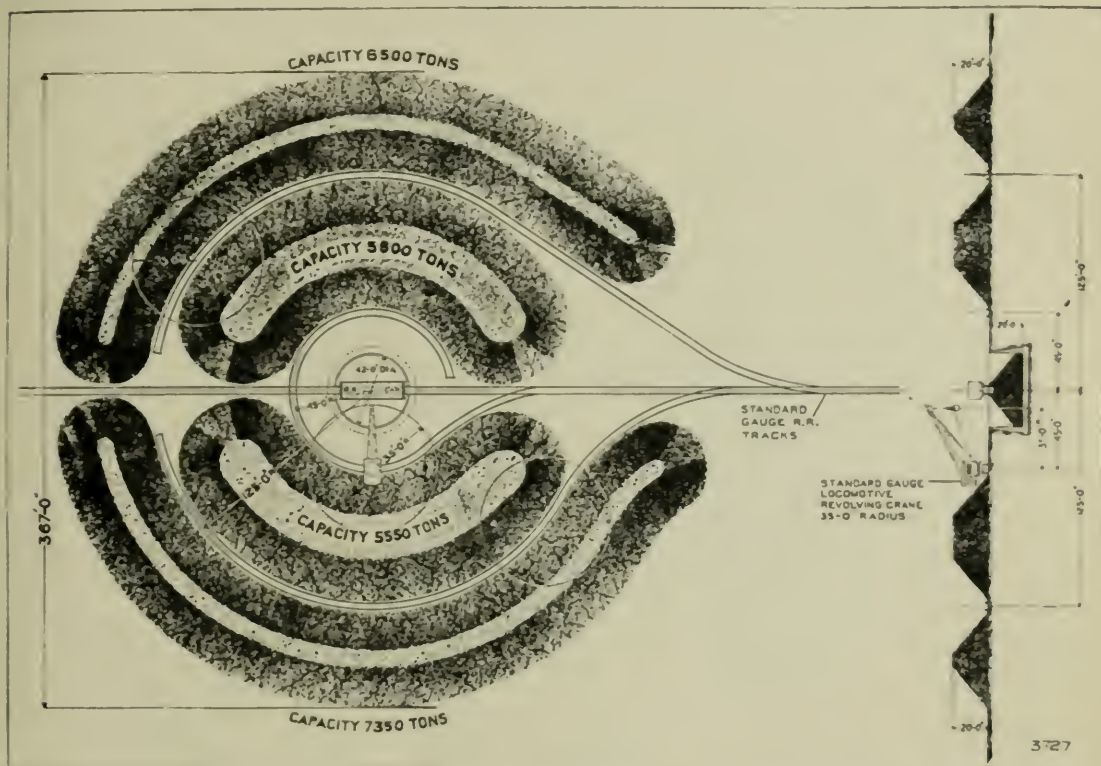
TWENTY-FIVE-THOUSAND-TON STORAGE PLANT
